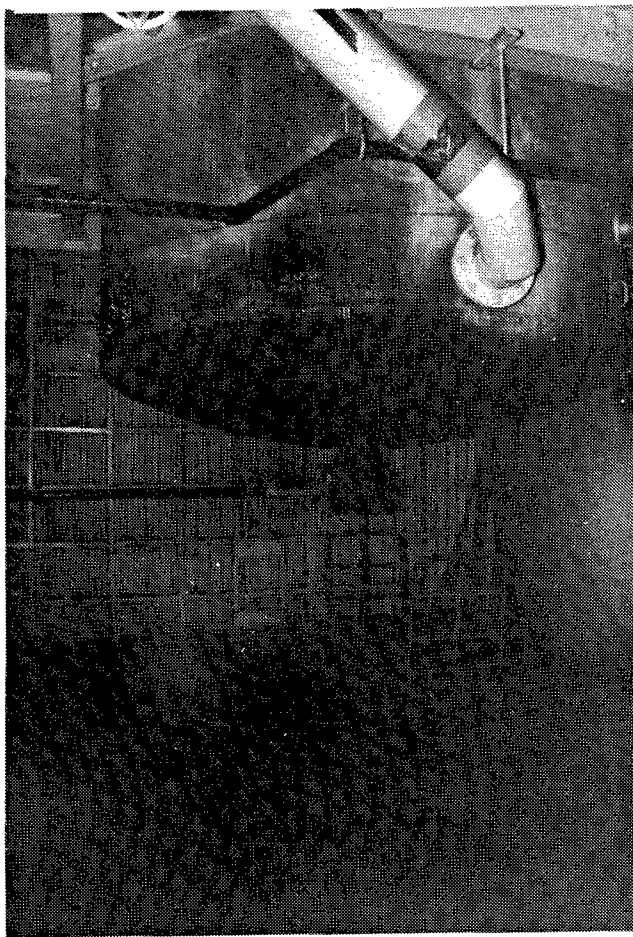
Building 1622: Bottom of tank on the first level of a Solvent Recovery House.
